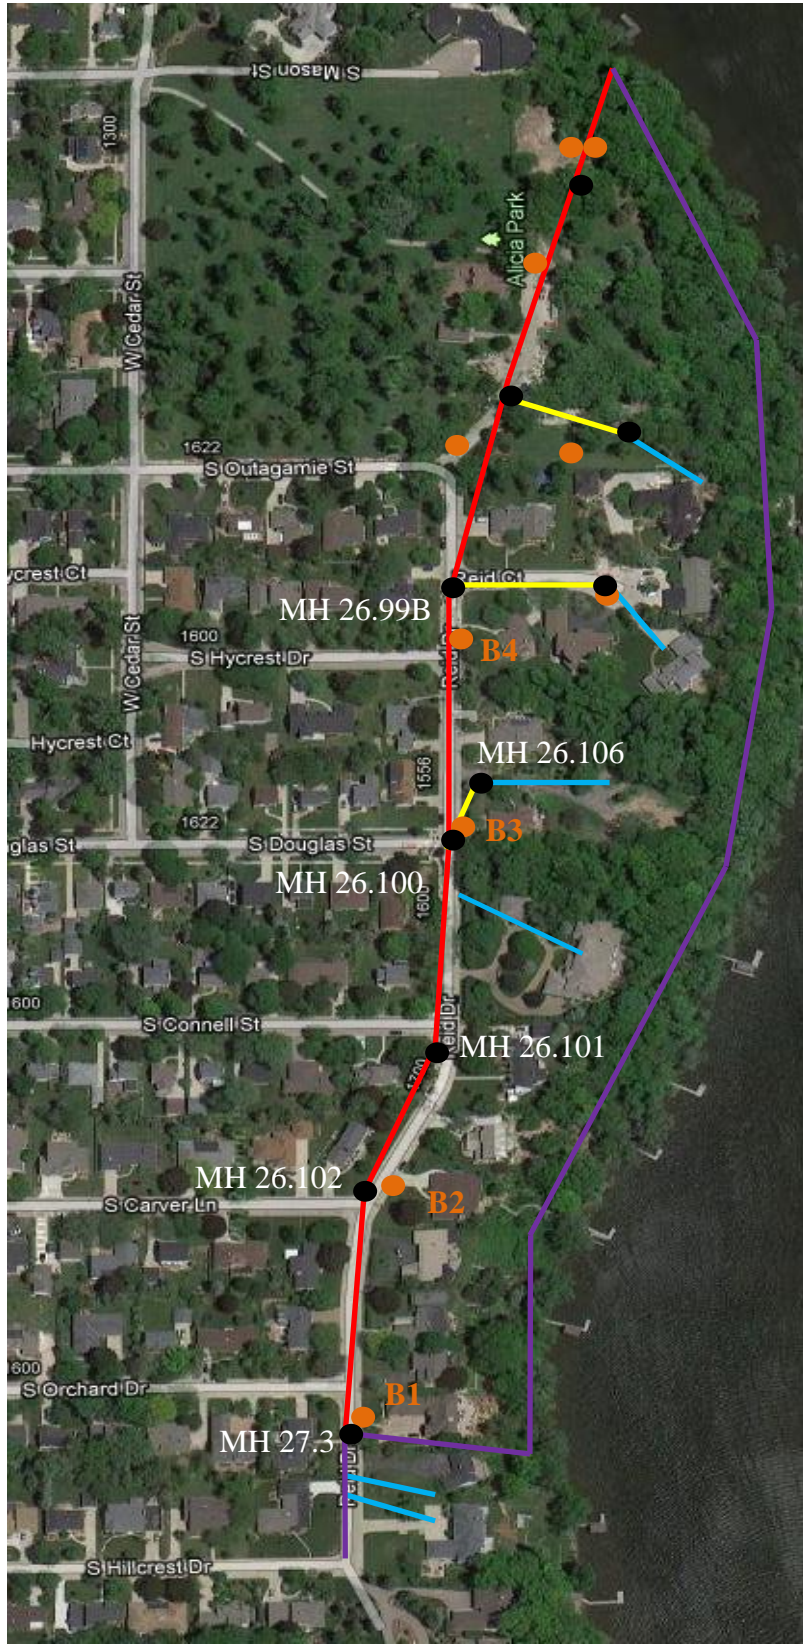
Plan View of Reid Drive Interceptor Project (Only manholes and borings relevant to collected data are labeled)
